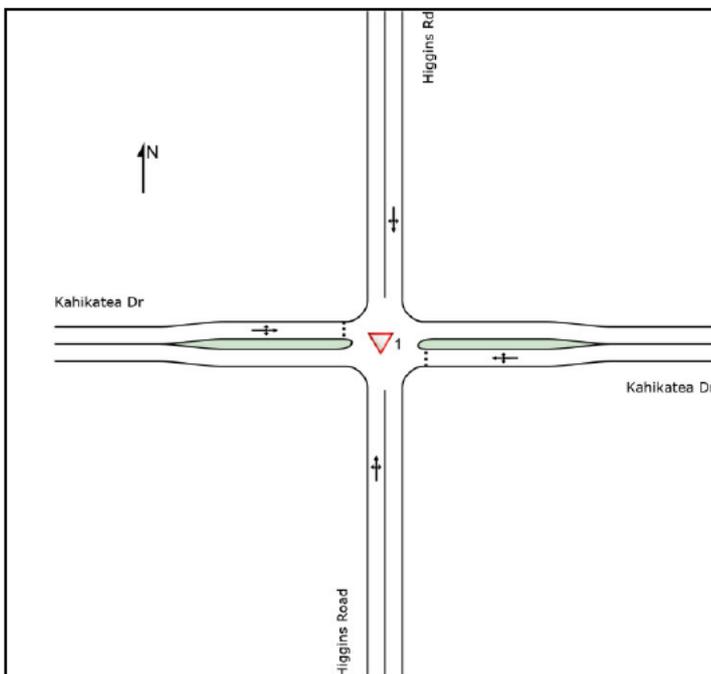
Existing Kahikatea Dr / Higgins Rd Intersection Layout
